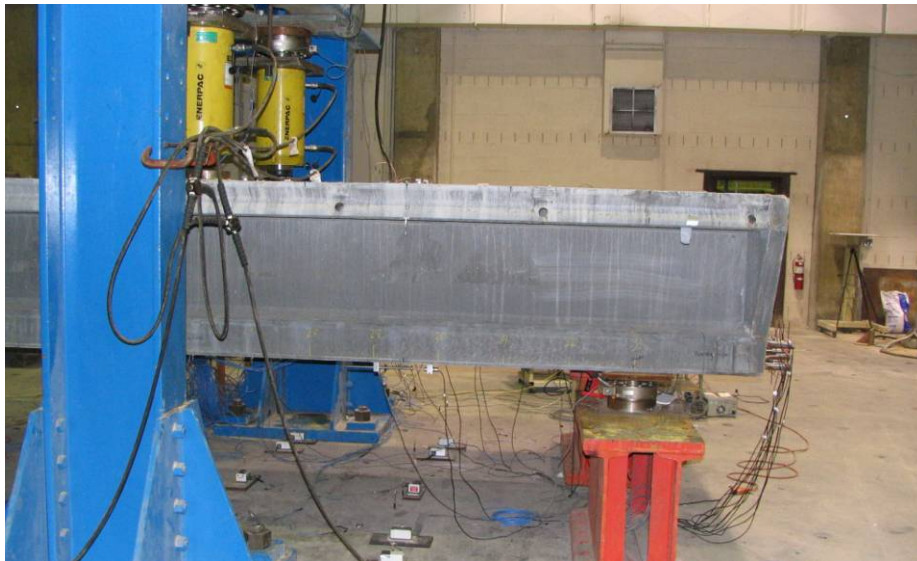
Photo. Load distribution test setup for Girder P4-21S.
